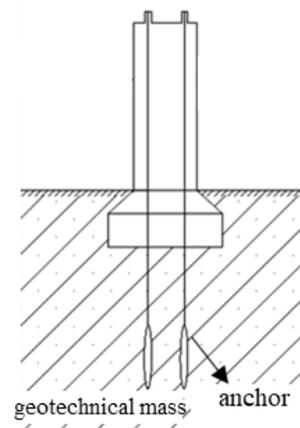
Representation of anchor in foundations reinforcement. Adapted from [12].
